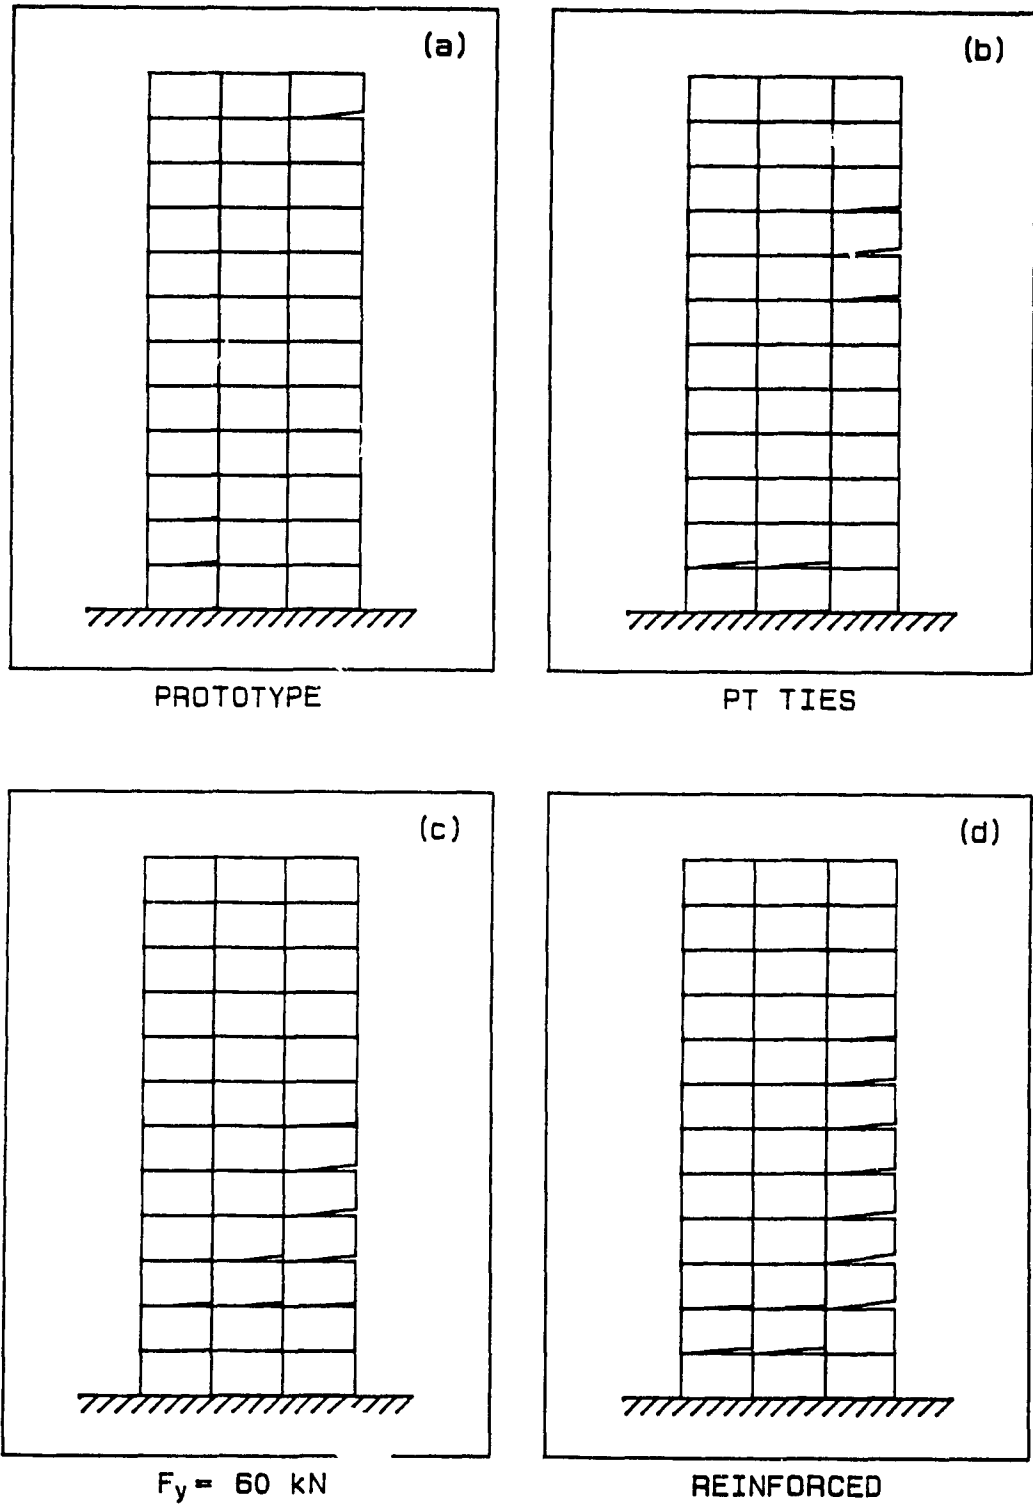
Deformed wall configurations at 2.0 seconds showing horizontal joint gap opening.
